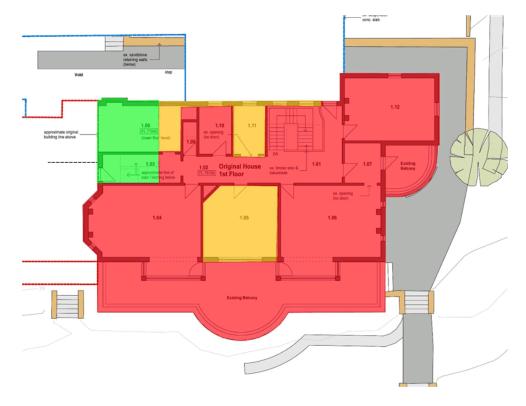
Broad areas of the building as introduced Section 4 (first floor). Adapted from X-Squared Architects
